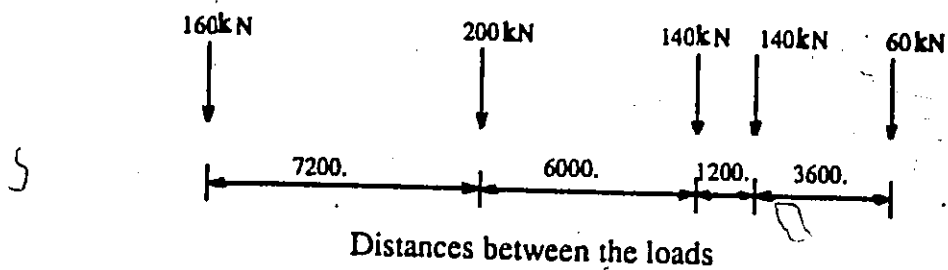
Load Position in the Cont. Box Girder Bridge
